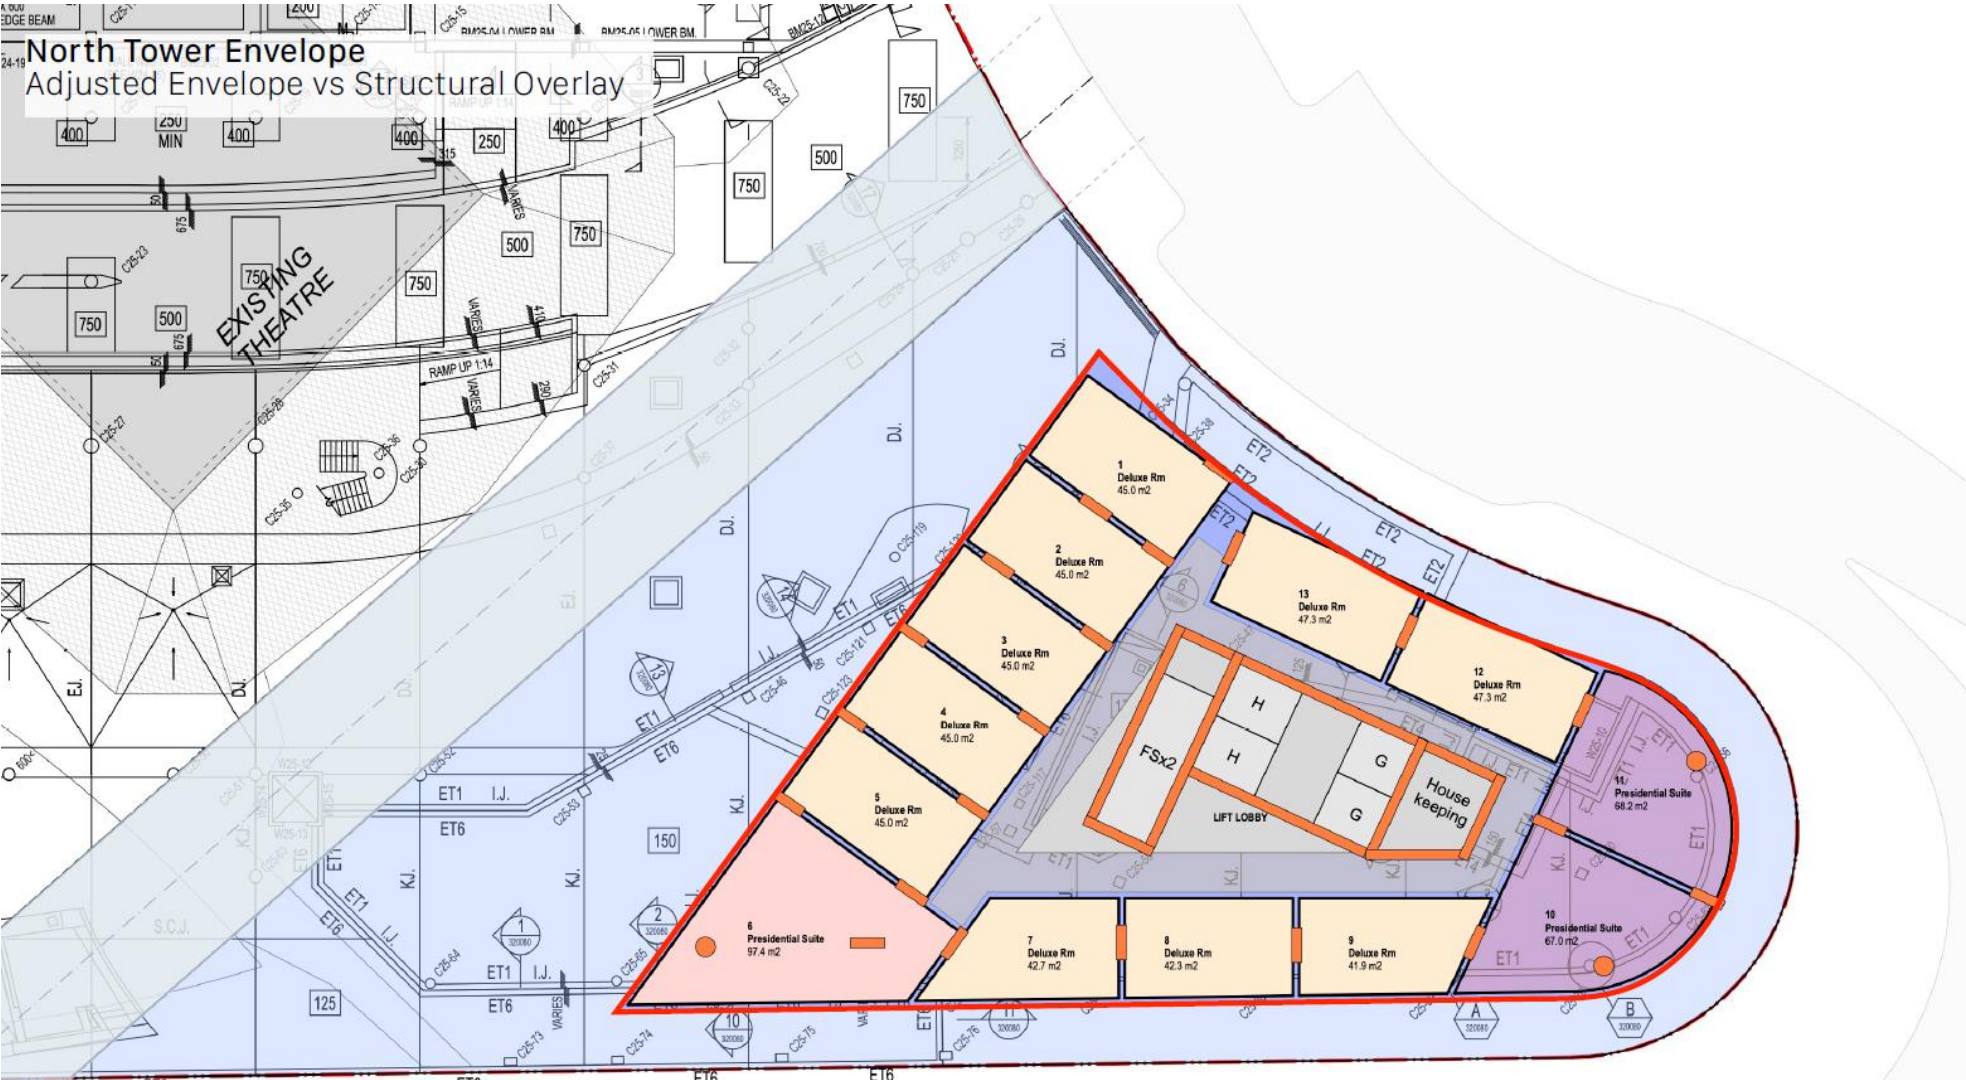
North Tower Envelope – Adjusted Envelope vs Structural Overlay – Structure (currently within existing basement) indicated in orange.
